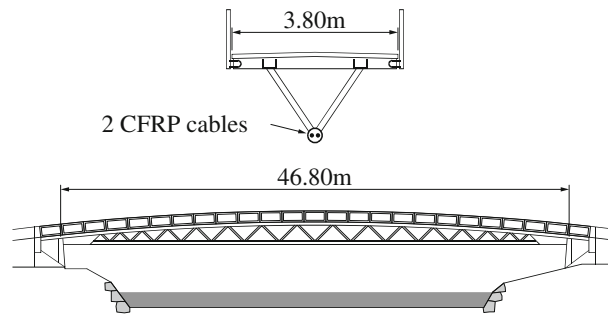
Cross section and elevation of the “Kleine Emme” bridge
